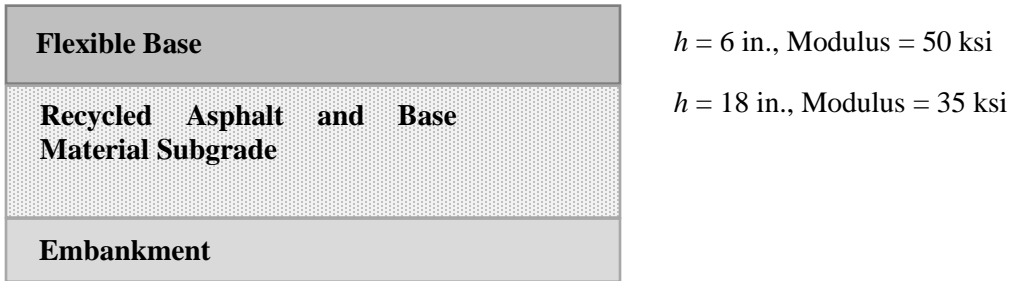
Pavement Structure and Design Parameters for SH 349 near Lamesa, TX.
